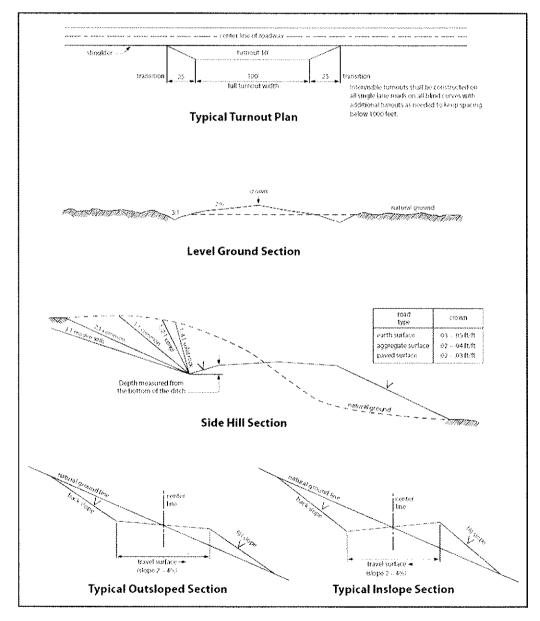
Typical road cross sections (BLM and USFS 2007).
